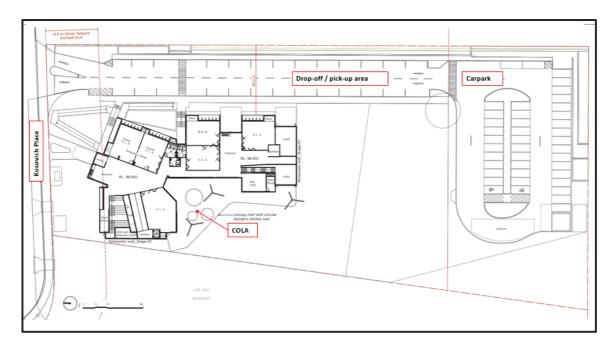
| Stage 1 Site layout (Source: Applicant's EIS 2018)
